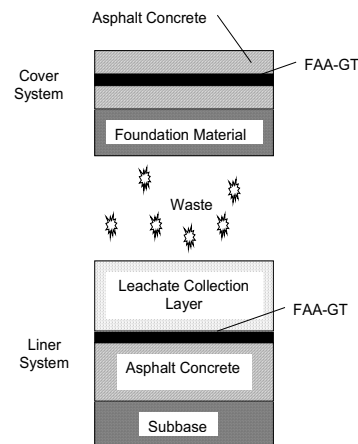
Examples of asphalt concrete and fluid applied asphalt-geotextile barrier applications.
